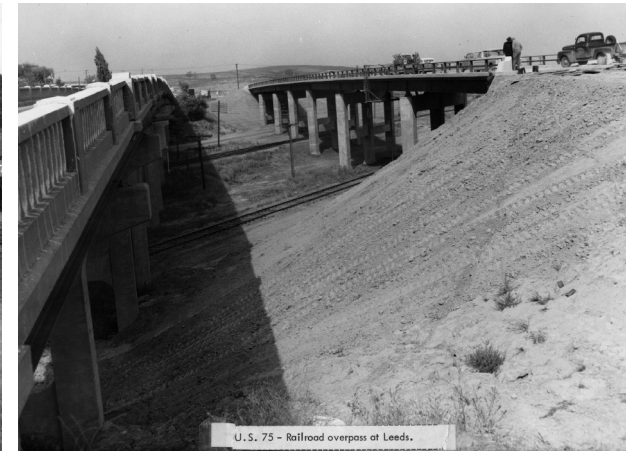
U.S. Highway 75 Railroad Overpass at Leeds, 1956
